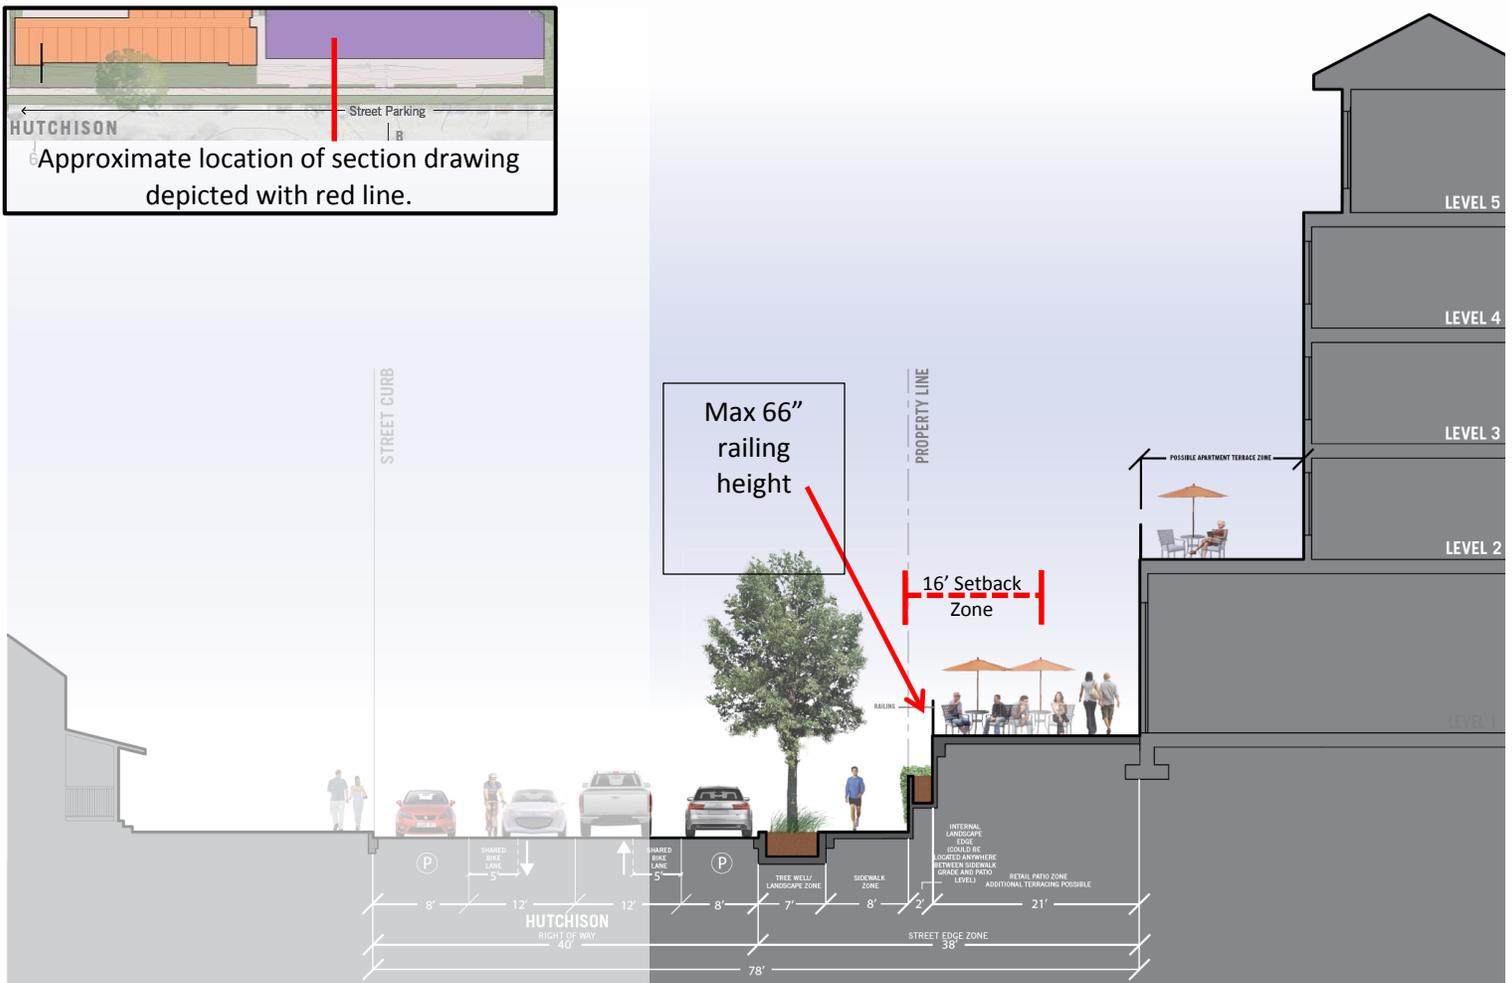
Hutchison Street streetscape design concept adjacent to retail space.
